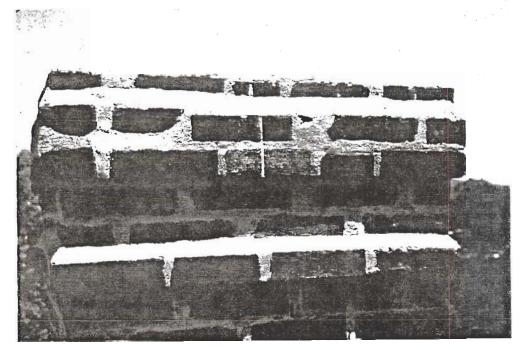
Masonry Chimney Detail at Roof Vent Structure.
